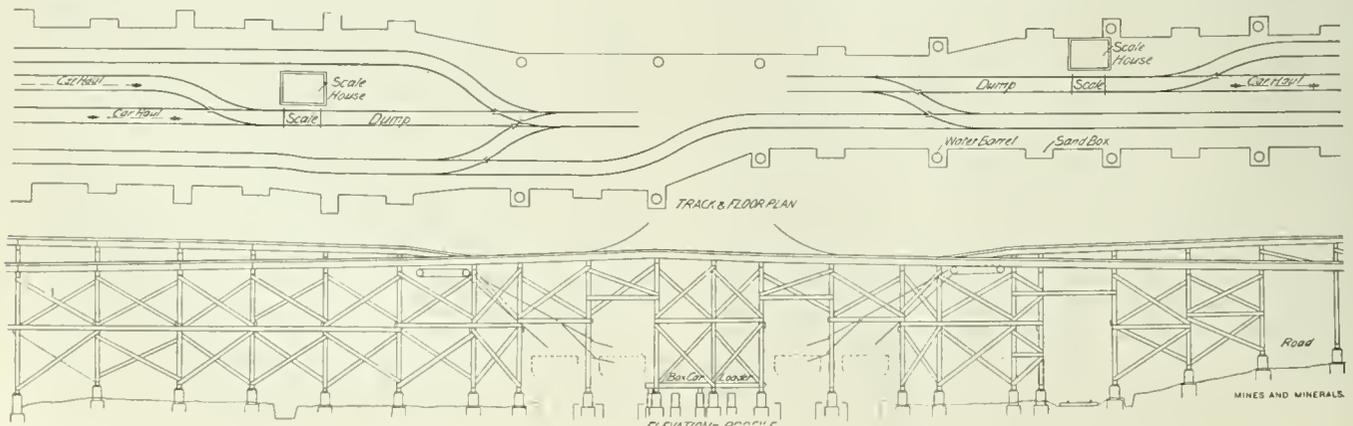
PLAN AND ELEVATION OF TIPPIL AT DELAGUA MINE
